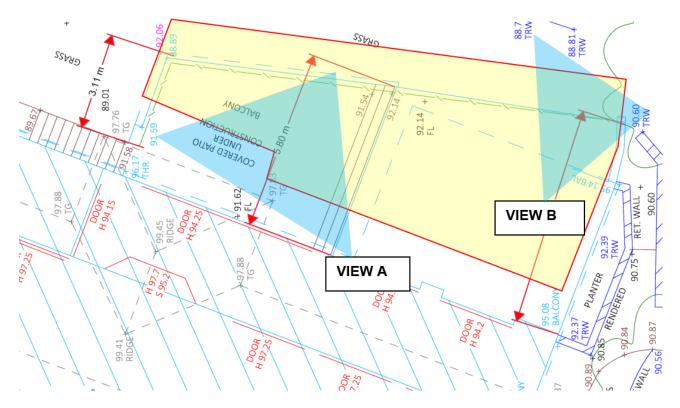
Site survey plan showing the projection of the second-floor terrace and balcony (highlighted in yellow), with approximate measurements included. (Source: ESA Surveys)
